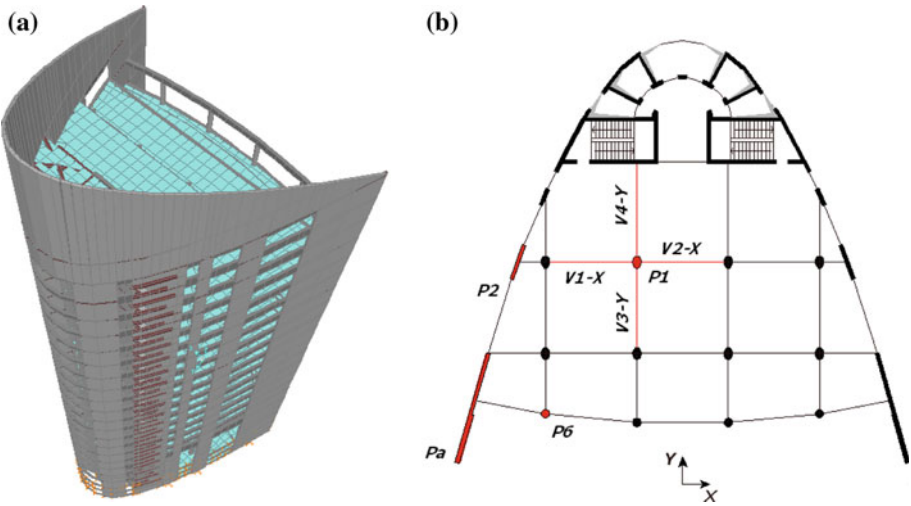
Monsanto Tower building: a view and b 3-D analytical model
